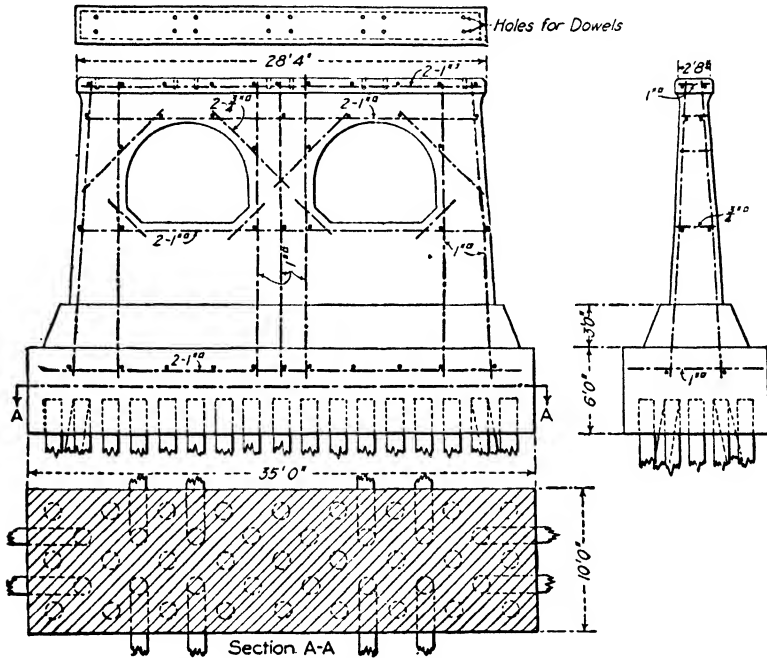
Piers for Bush and Gunpowder River Bridges.
